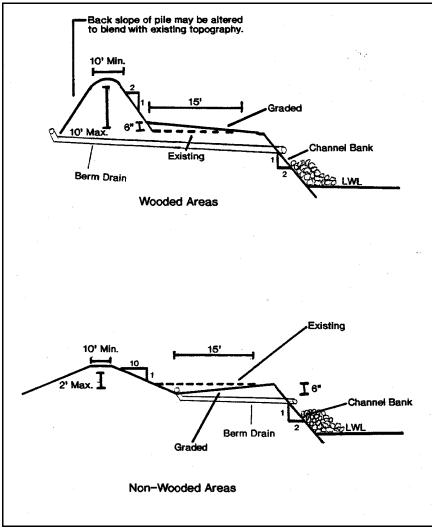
Grading and access road details (Source: CBBEL Files)
